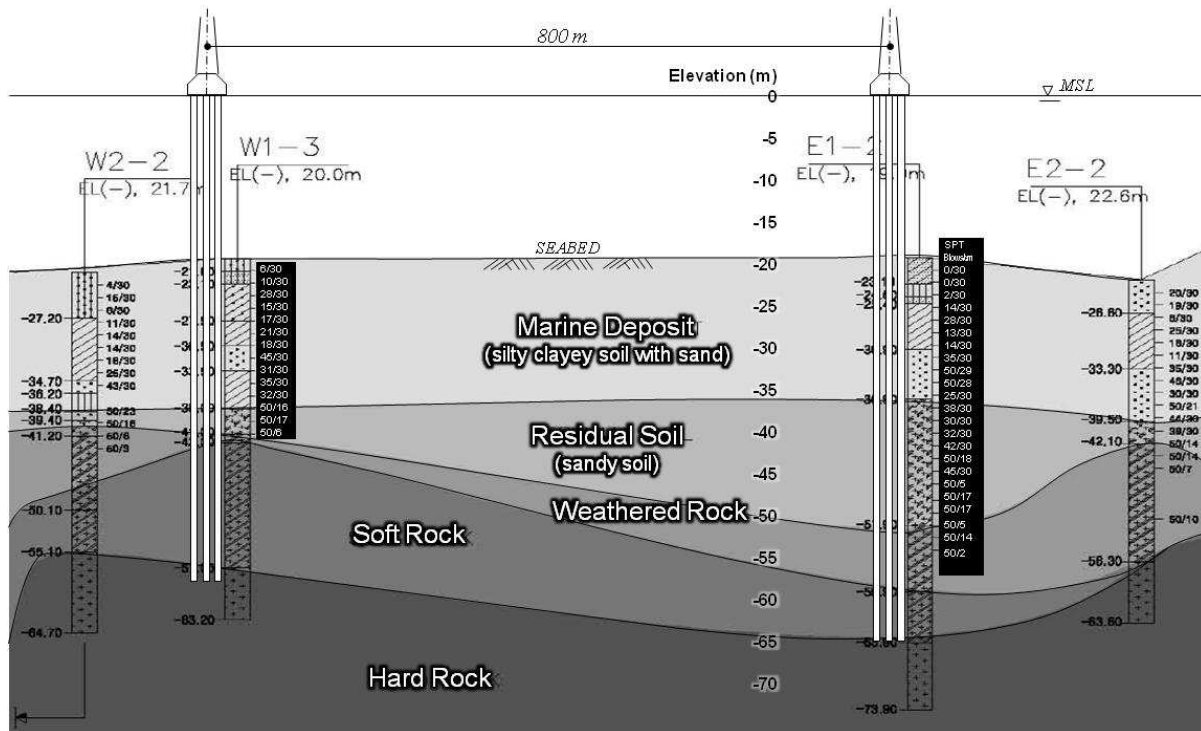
Ground profile with boring log at the main span of the cable-stayed bridge
